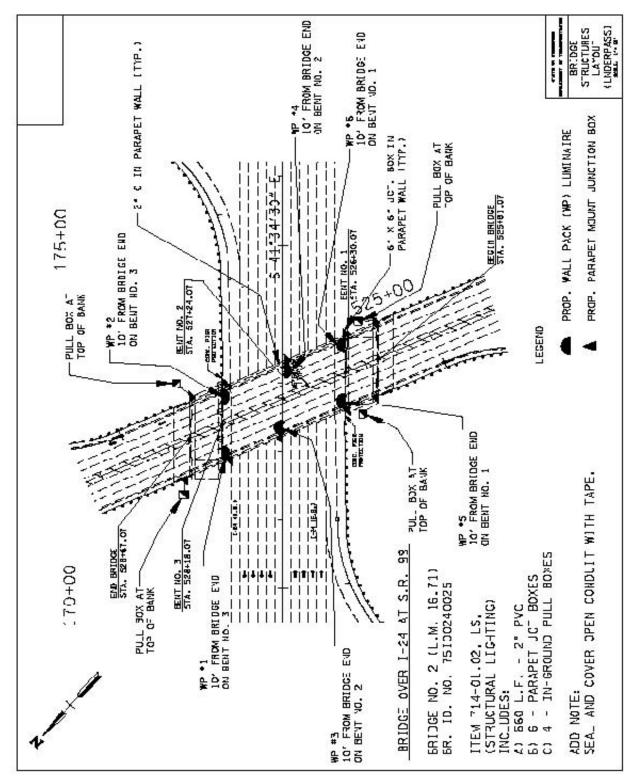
Detail of Underpass Bridge Lighting for Submittal to Structures
